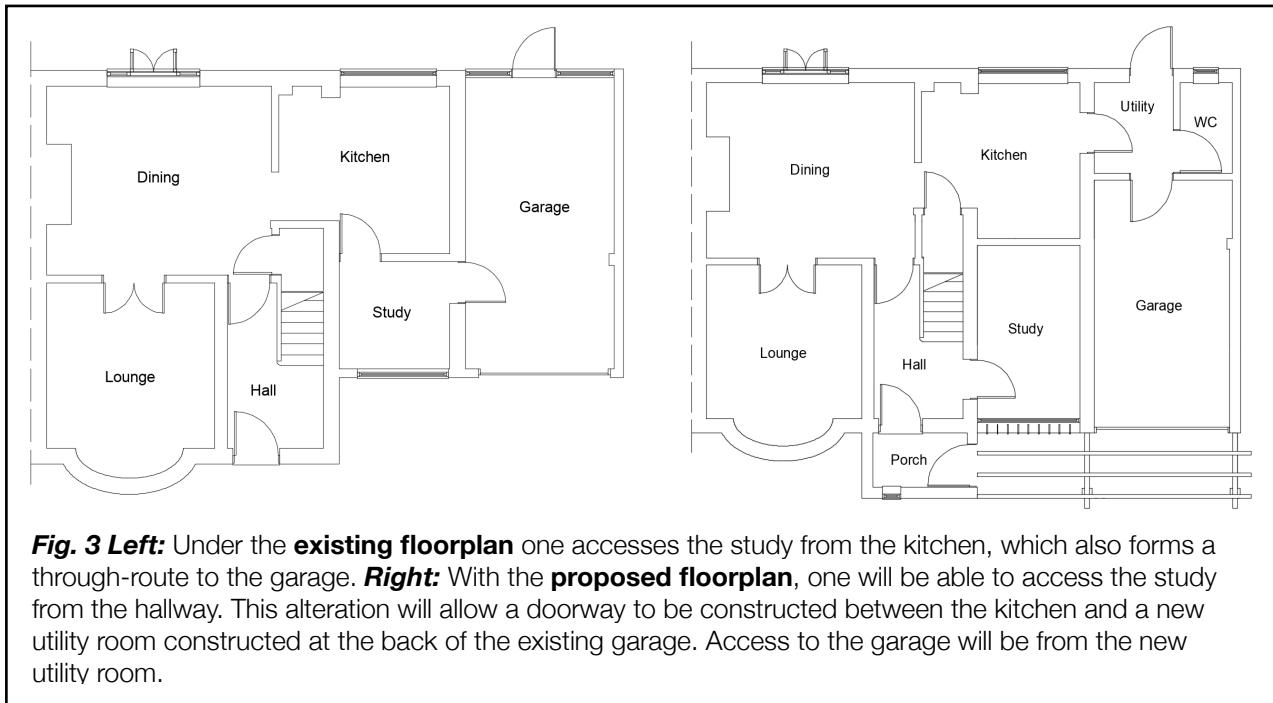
Left: Under the existing floorplan one accesses the study from the kitchen, which also forms a through-route to the garage. Right: With the proposed floorplan, one will be able to access the study from the hallway. This alteration will allow a doorway to be constructed between the kitchen and a new utility room constructed at the back of the existing garage. Access to the garage will be from the new utility room.
